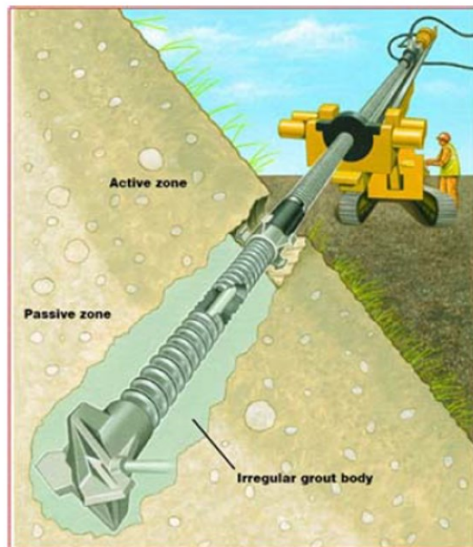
Self-drilling micropile system along the grout bonding length. Solution for the stage roof foundation.
